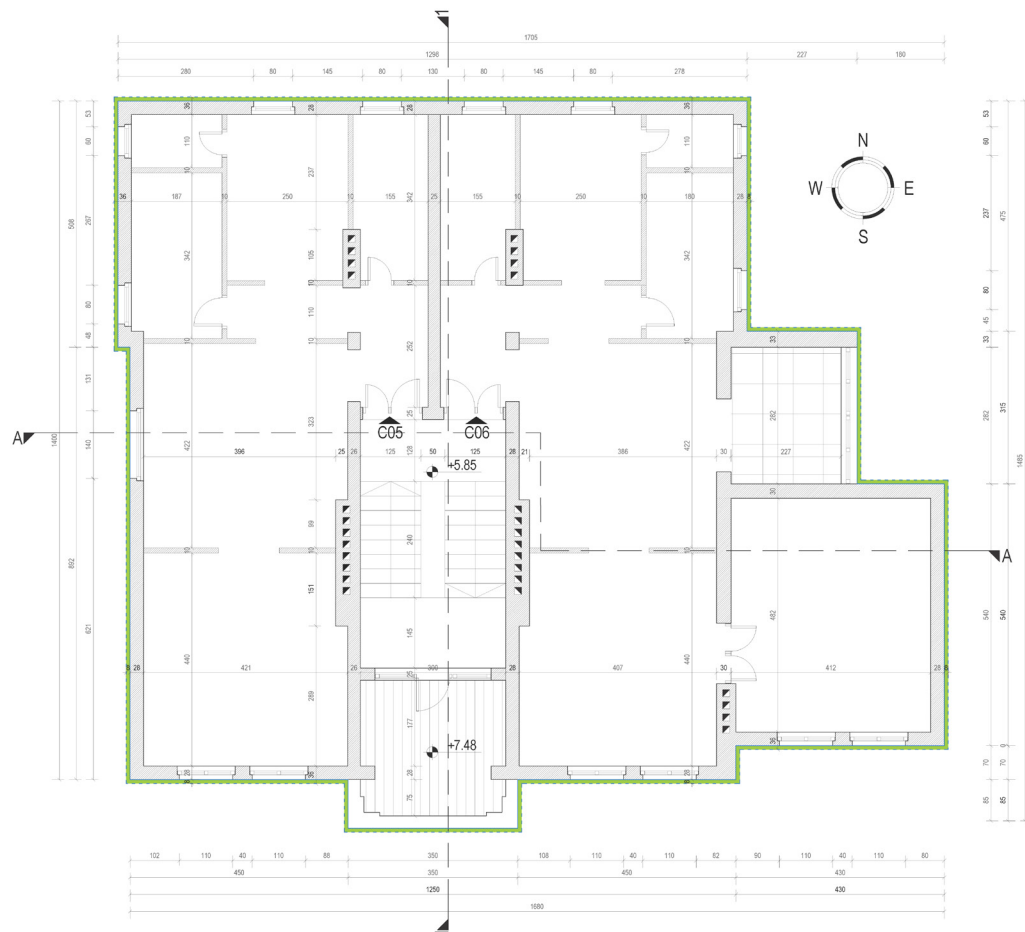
Typical floor plan of the case study building, Author's drawing based on Archive design and on-site measurements
